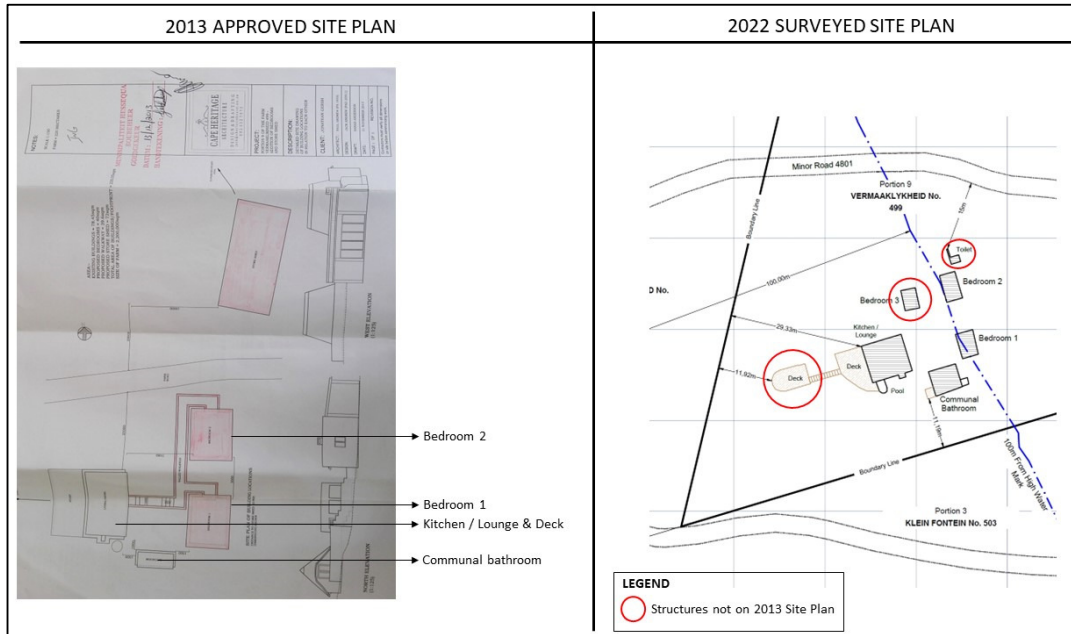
PLAN SHOWING BUILDINGS / STRUCTURES NOT APPROVED ON 2013 SITE PLAN
